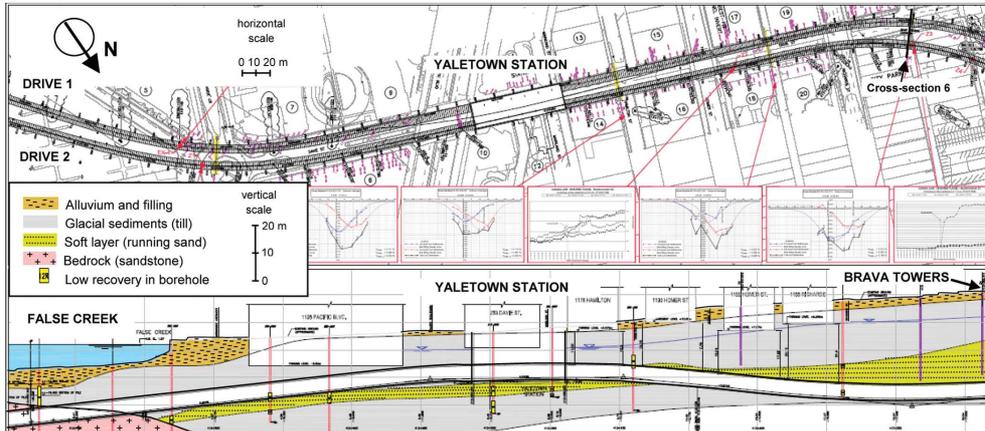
Plan of Canada Line from False Creek to Brava Towers and geological profile along tunnel alignment (ratio of vertical to horizontal scale, 1:2).
